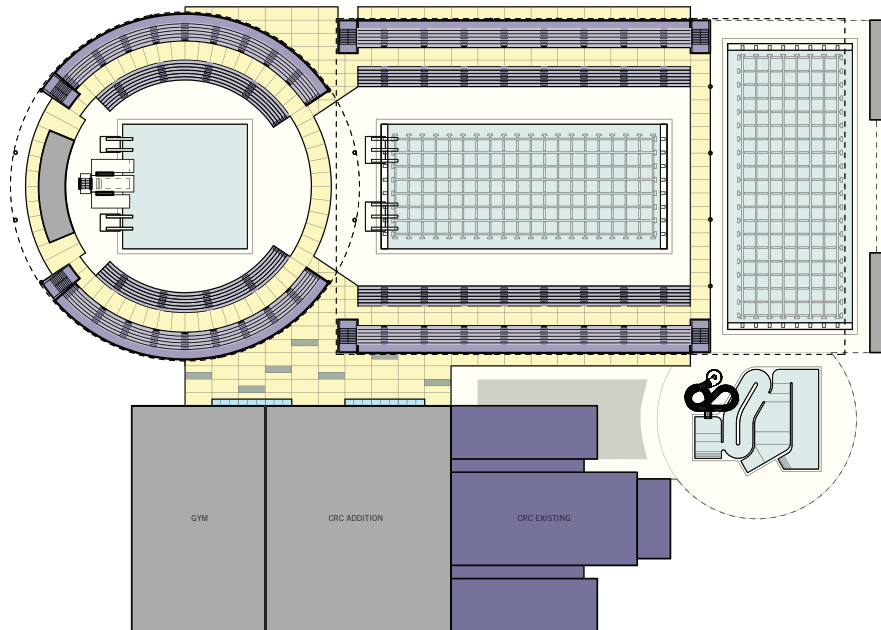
ELS Level Two Floor Plan - June 24, 2014
